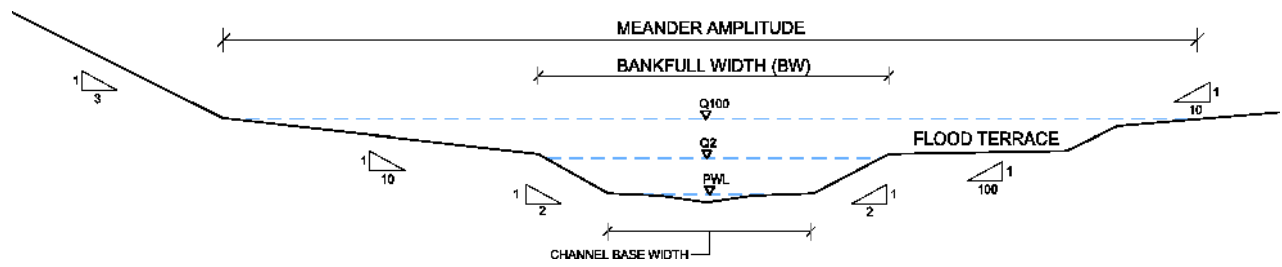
Typical section of the Roslyn Stream realignment in terms of flooding profiles
